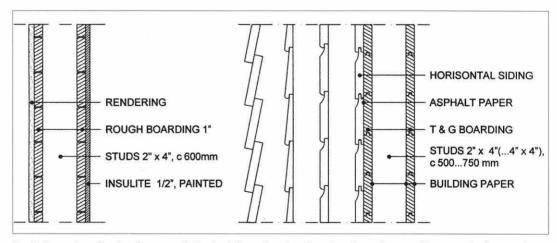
Examples of timber frame wall. On the left rendered wall and on the right typical horizontal sidings. Left one was used in Drug Store in Lauritsala designed by the architect Erkki Huttunen. Sources: Left one: Arkkitehti 1935 and Archives of Finnish Museum of Architecture. Right one: W. Keinänen: Puumiehen Rakennusoppi, Porvoo 1925. Vertical sections, scale 1:10. Redrawn by author.
